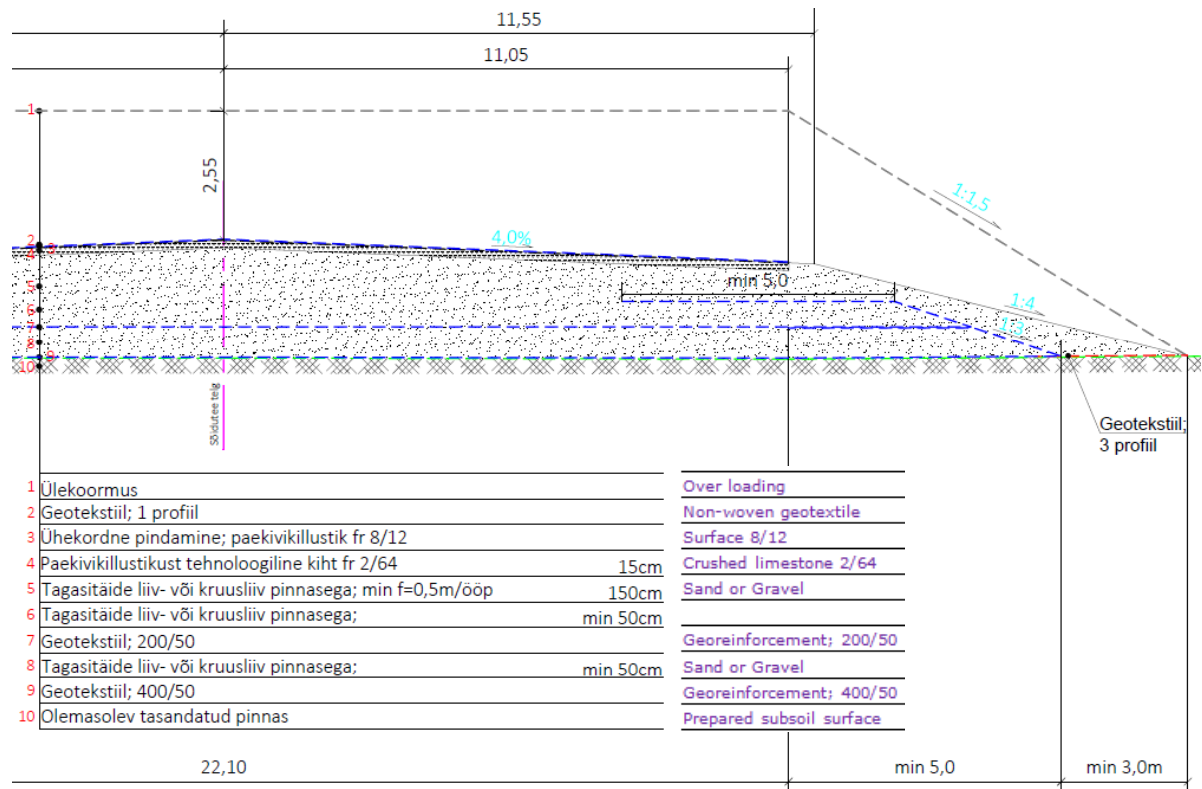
Cross-section of section 2 (two layers of georeinforcements)
